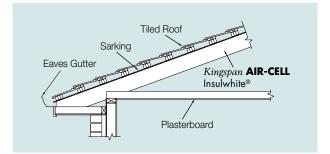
Side elevation of *Kingspan* AIR-CELL Insulwhite[®] in a pitched tiled roof retrofit (attic conversion)
